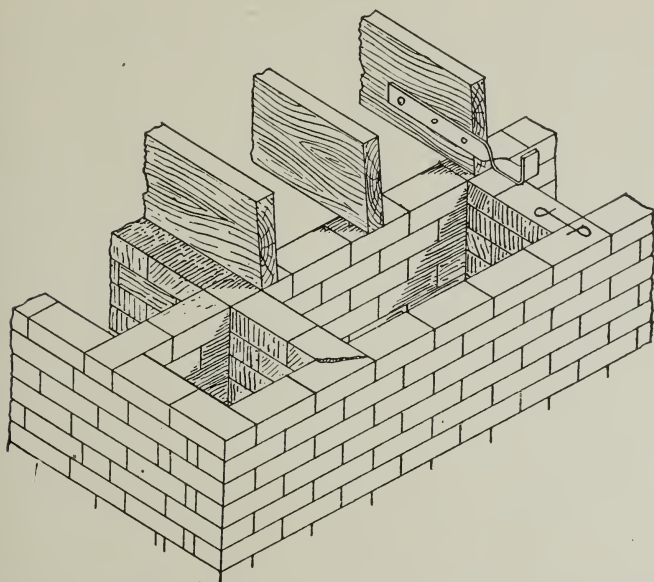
Brick Hollow-wall Construction. Congress Hall, Saratoga, N. Y.
